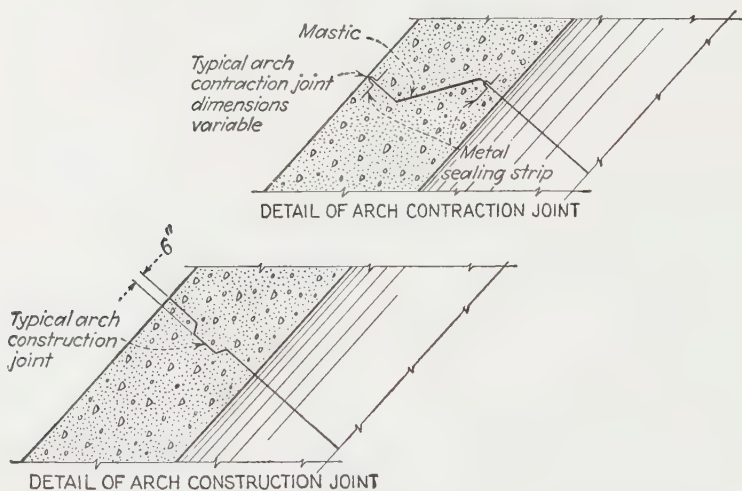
Bartlett Dam, detail of arch construction and contraction joints.
